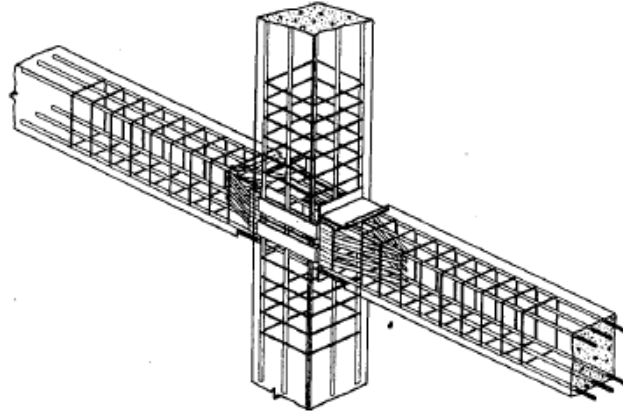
Welded connection at column face (Bhatt and Kirk, 1985)
